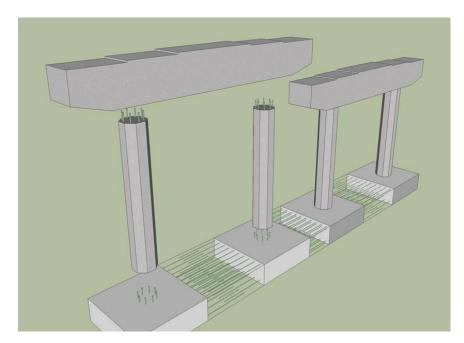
Precast Open Frame Pier Bent Sketch
